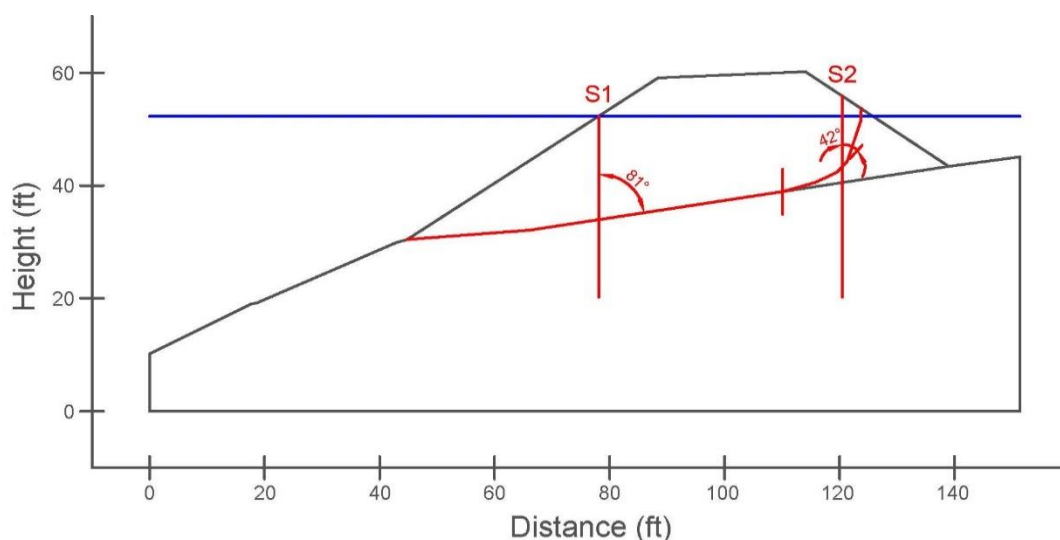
Sub-sectioning of the cross-section and failure plane for Asele Road Embankment
